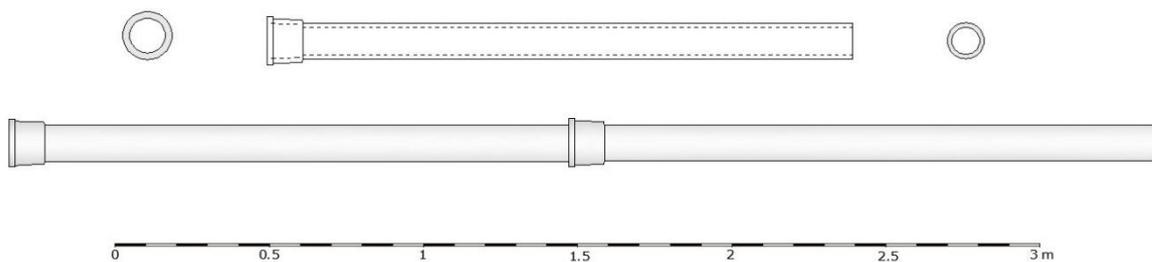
A reconstruction drawing of the socketed pipes showing how the pipes would have been fitted together
